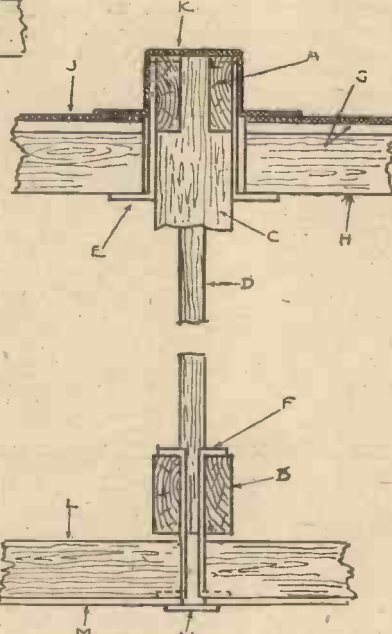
DETAIL OF TIMBER ROOF TRUSS WITH UNDERSLUNG ROOF AND CEILING UNITS
